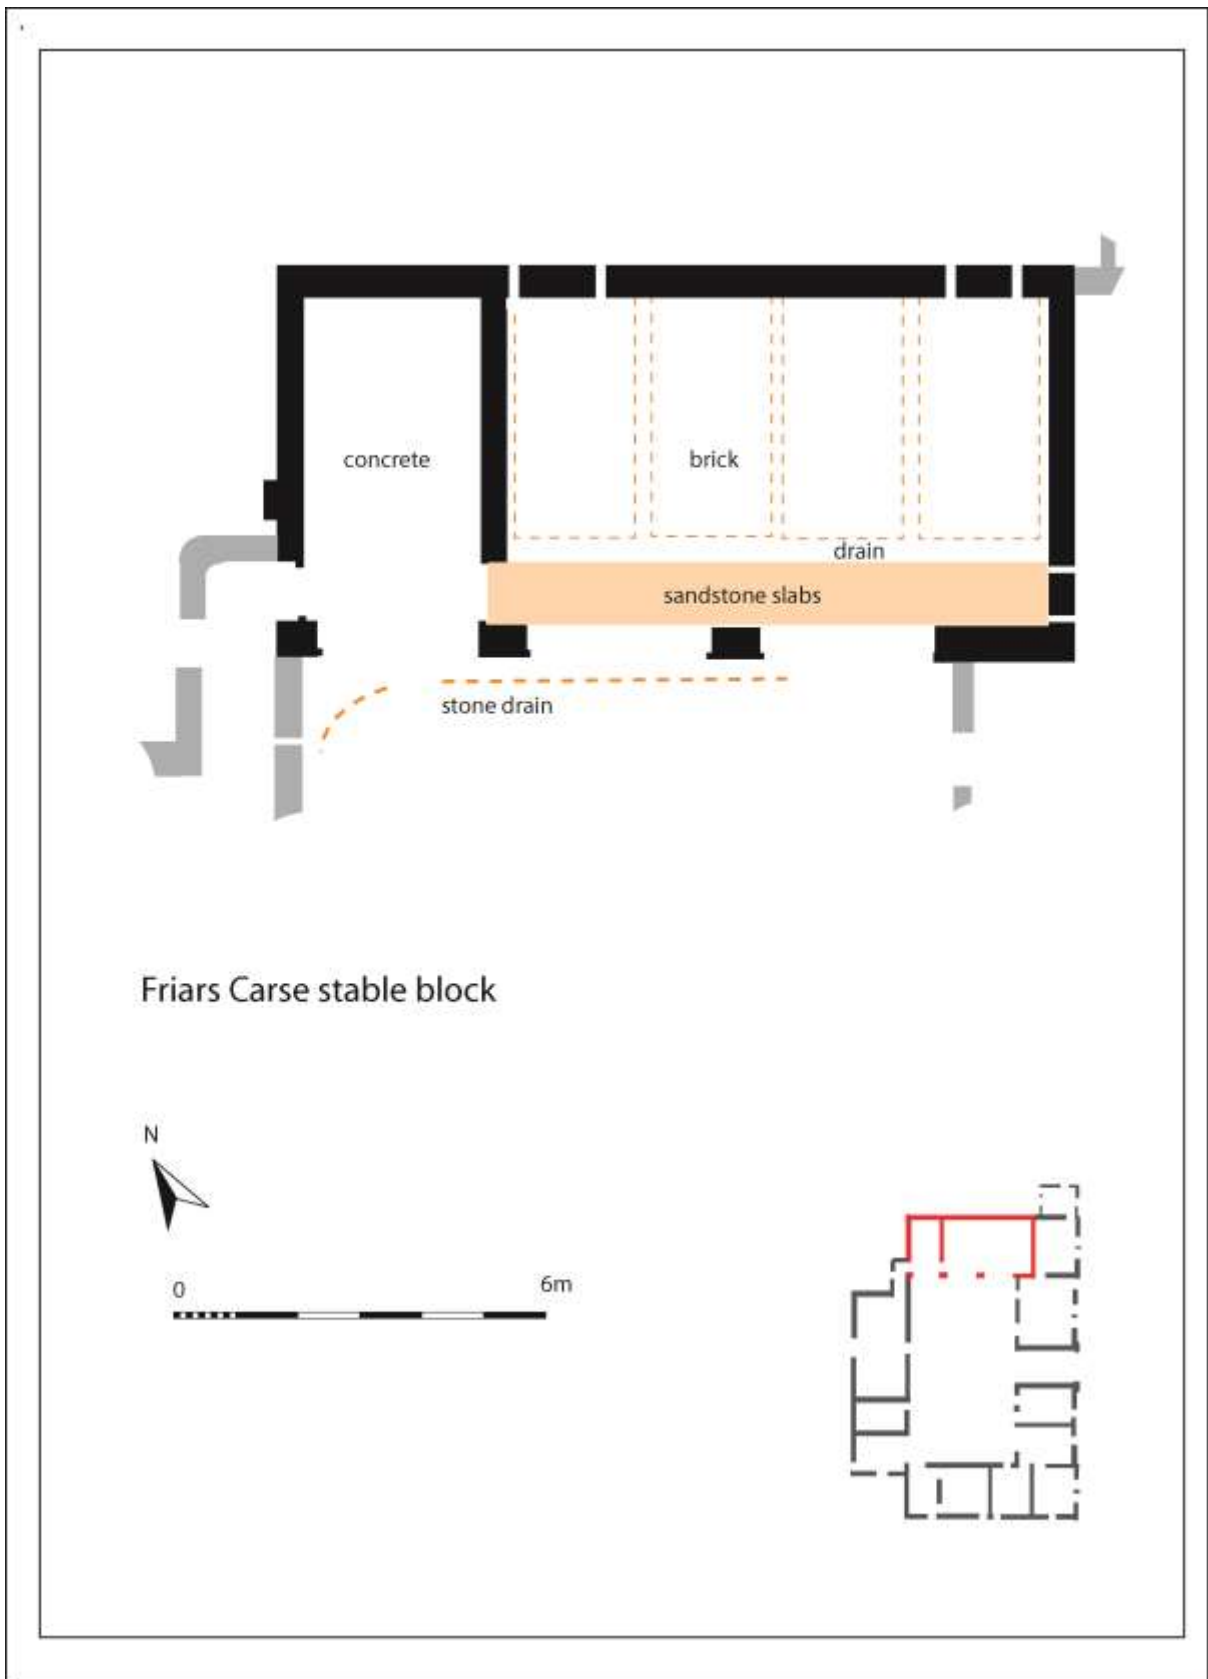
Sketch plan of north wing showing relationship with the rest of the stable block.
